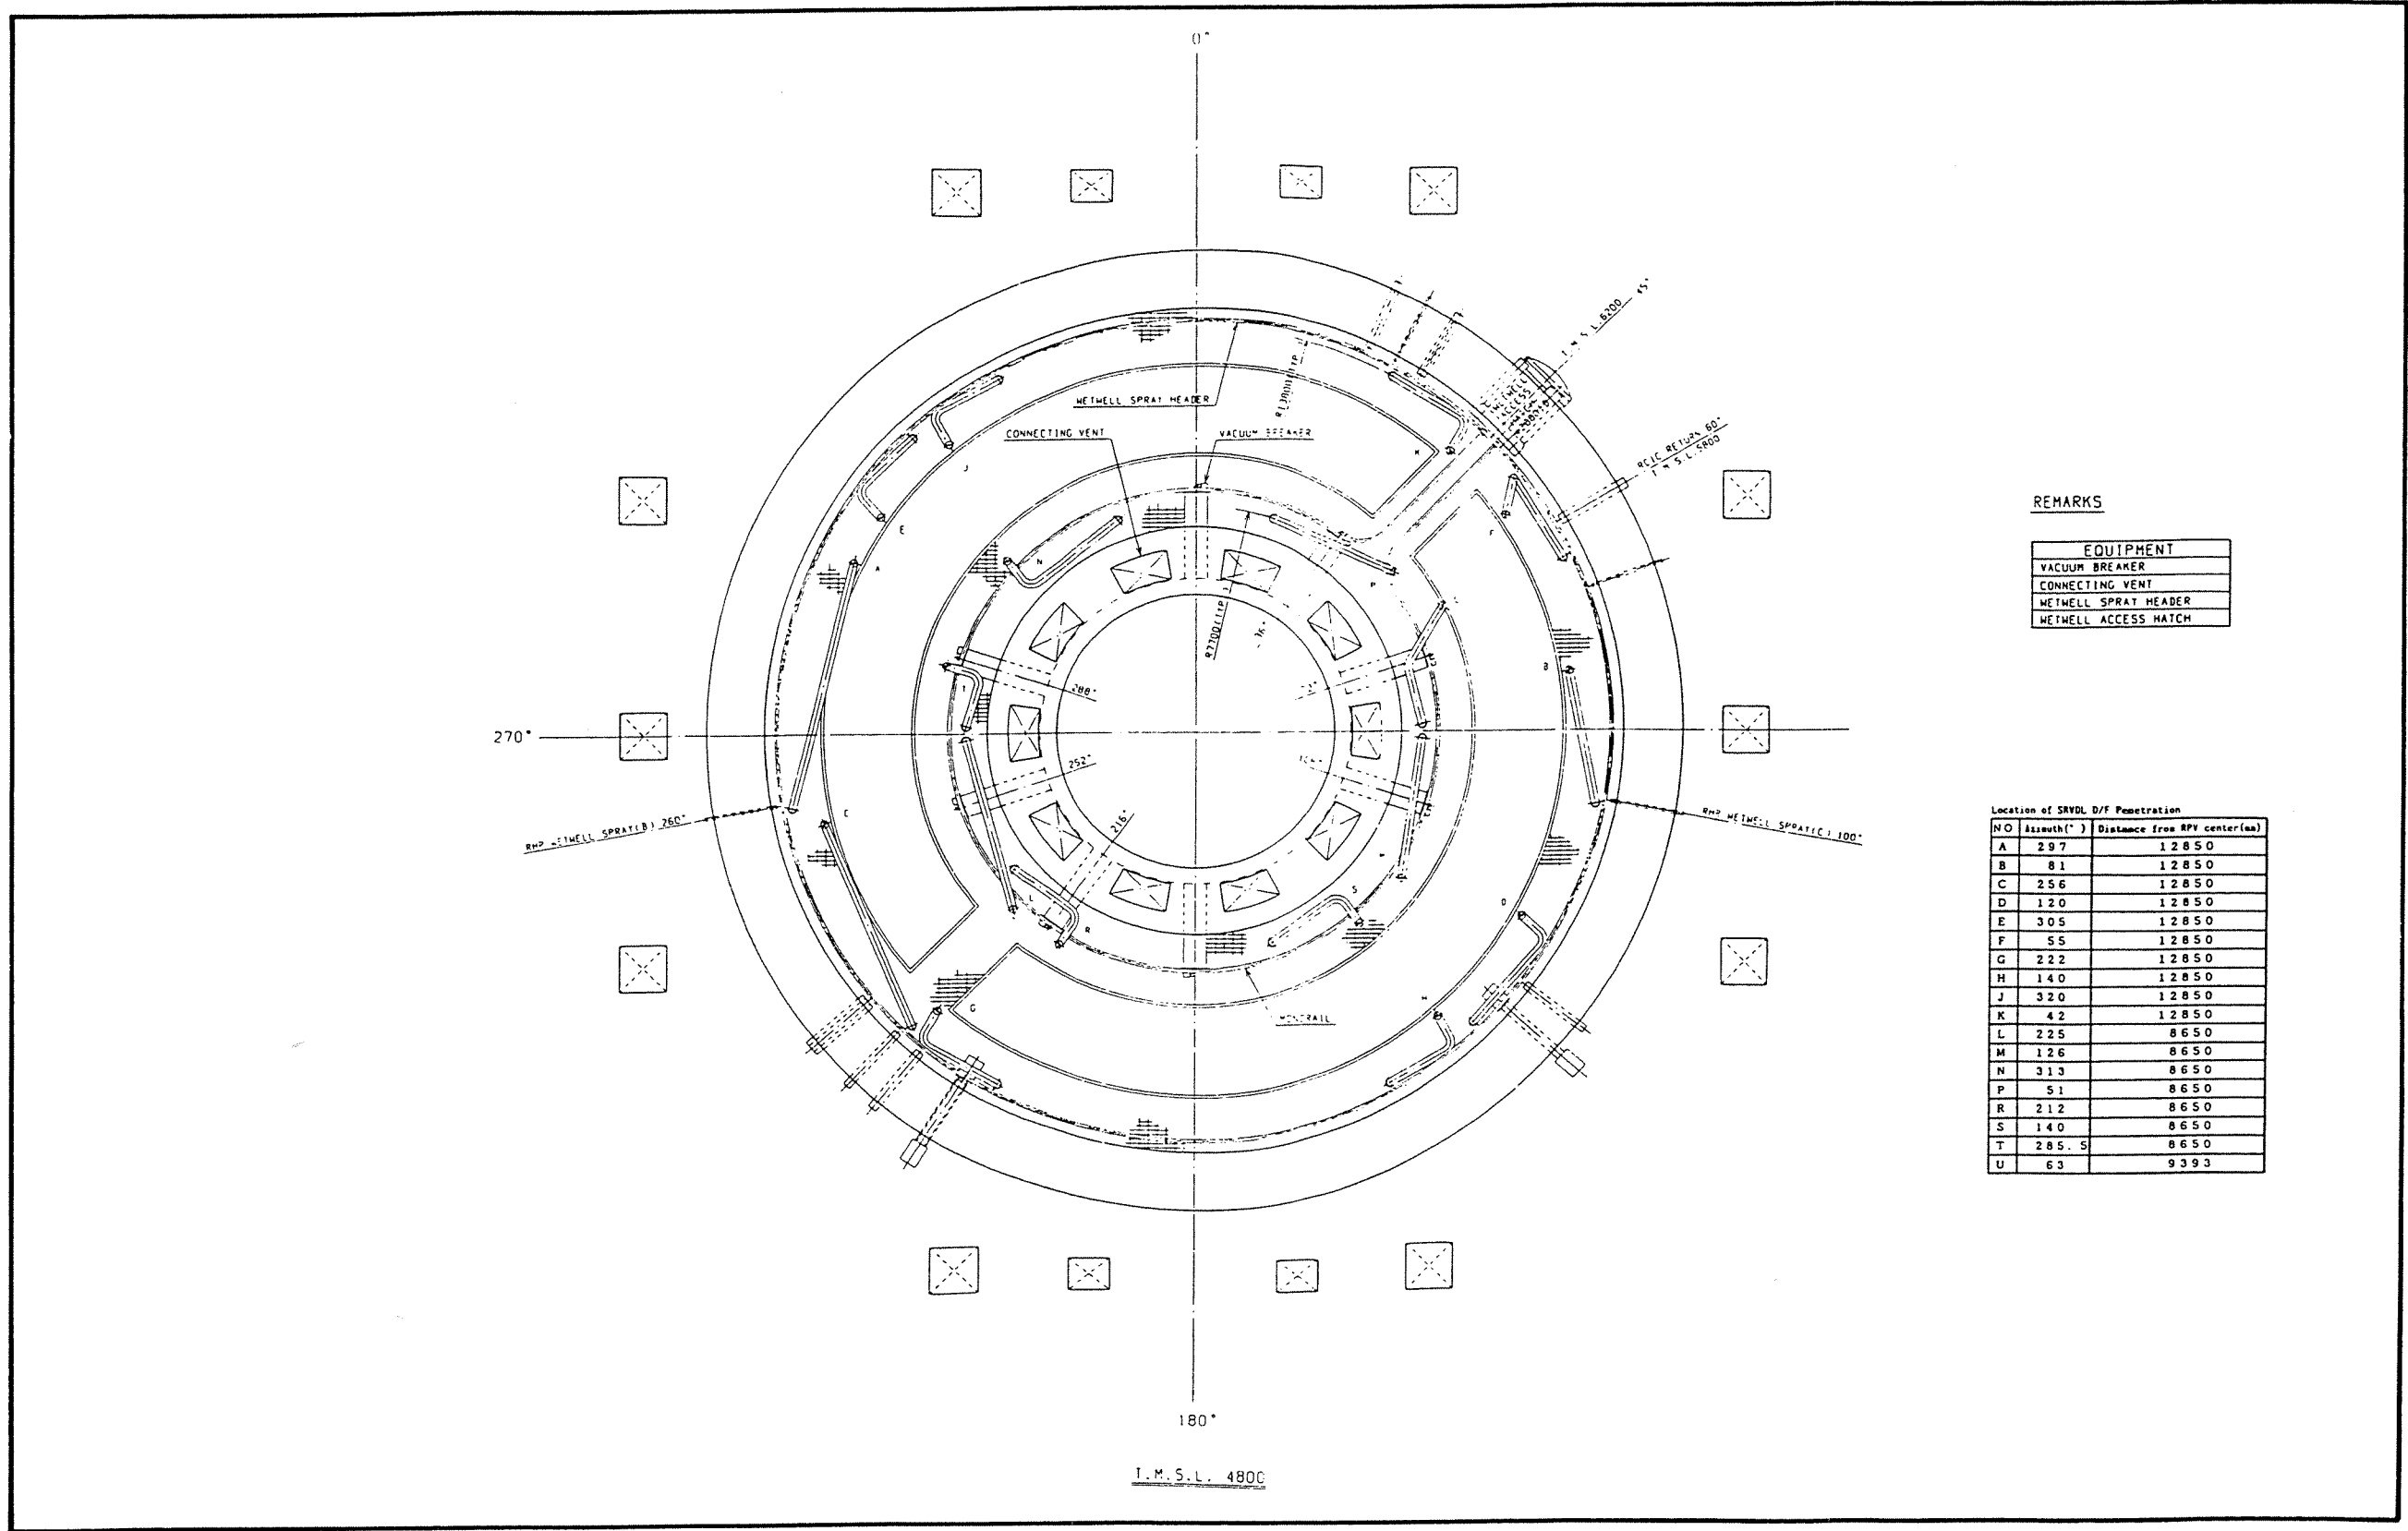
WETWELL, ARRANGEMENT PLAN AT EL. -1700 mm
